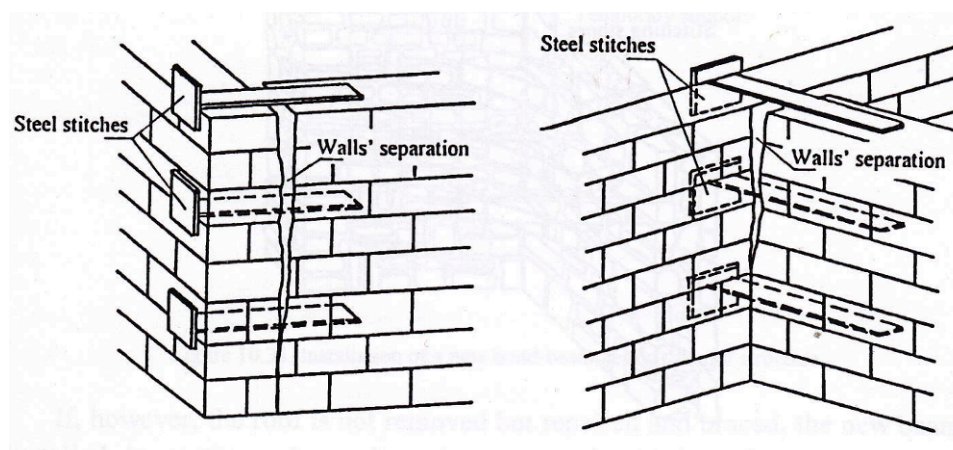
Strengthening of the corner zone of a stone-masonry wall with metal stitching [21]
